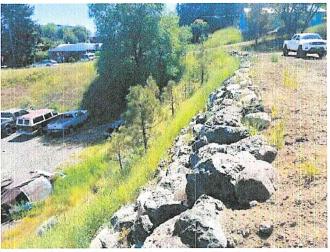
Looking northeast from a point near the west end of the site (lower bench).
